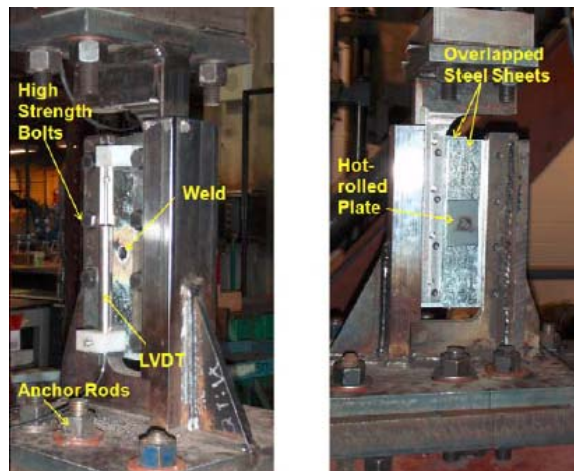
Shear test assembly used by Guenfoud (Guenfoud, 2010).
